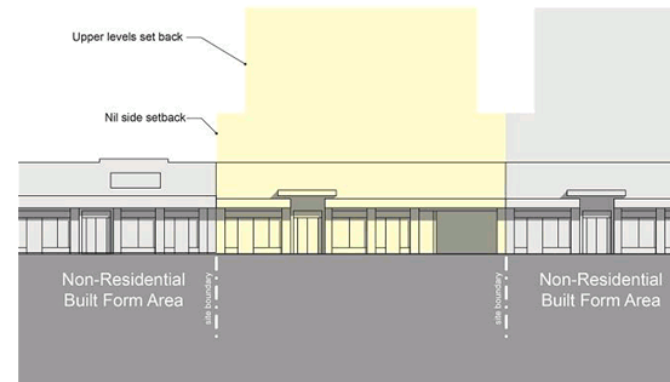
Side boundary setbacks adjoining non-residential area
